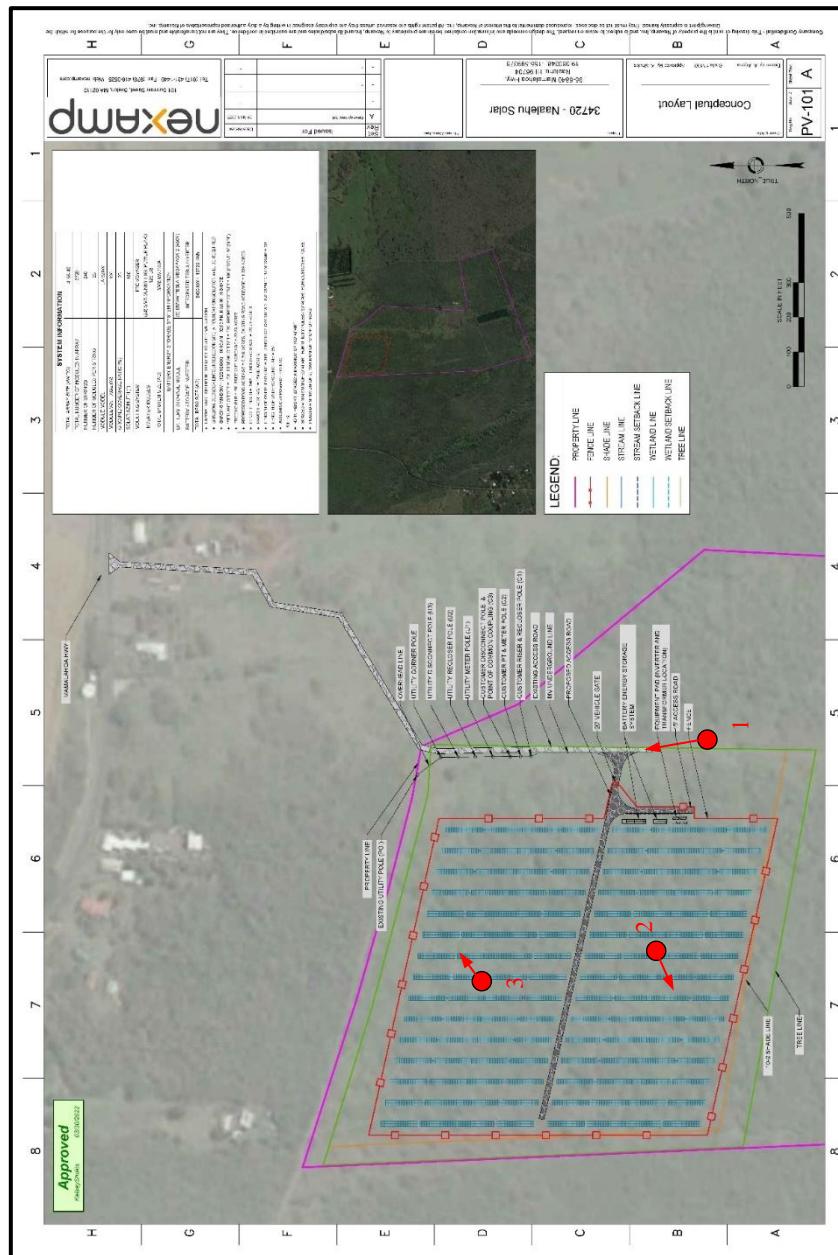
Site Plan Showing Field Inspection Photograph Locations and Directions (see Figure 10).
